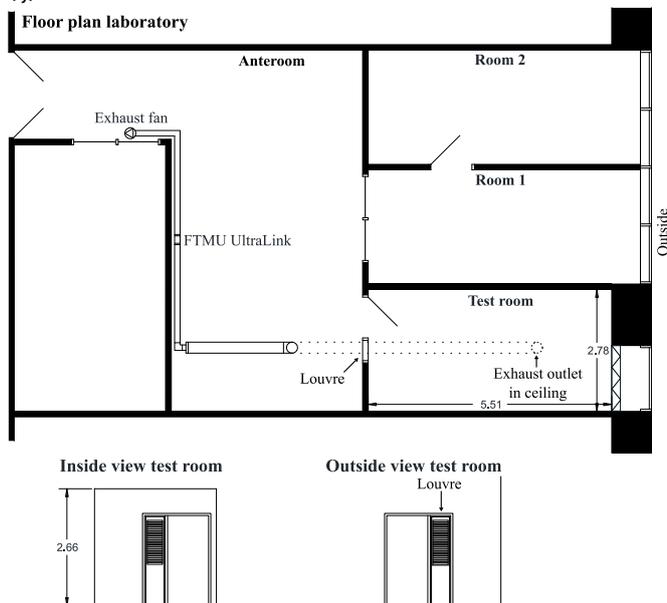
Floor plan of laboratory area and, inside and outside view of test room.
